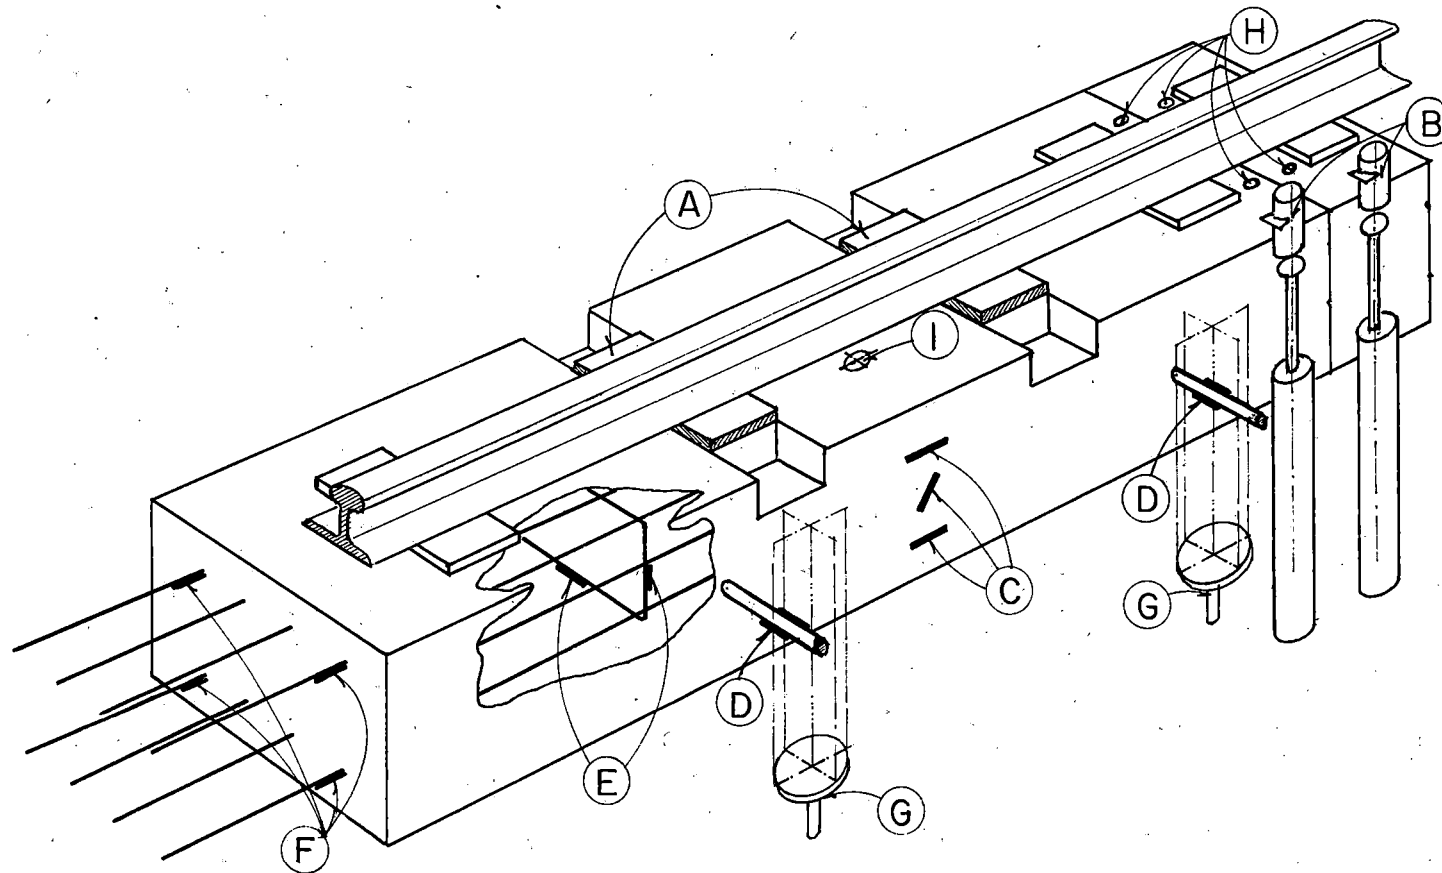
INSTRUMENTATION LAYOUT FOR SLAB TRACK SECTION
